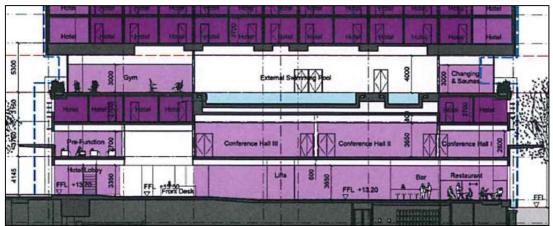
Approved section of Levels 1 to 3 of Hotel including swimming pool.
